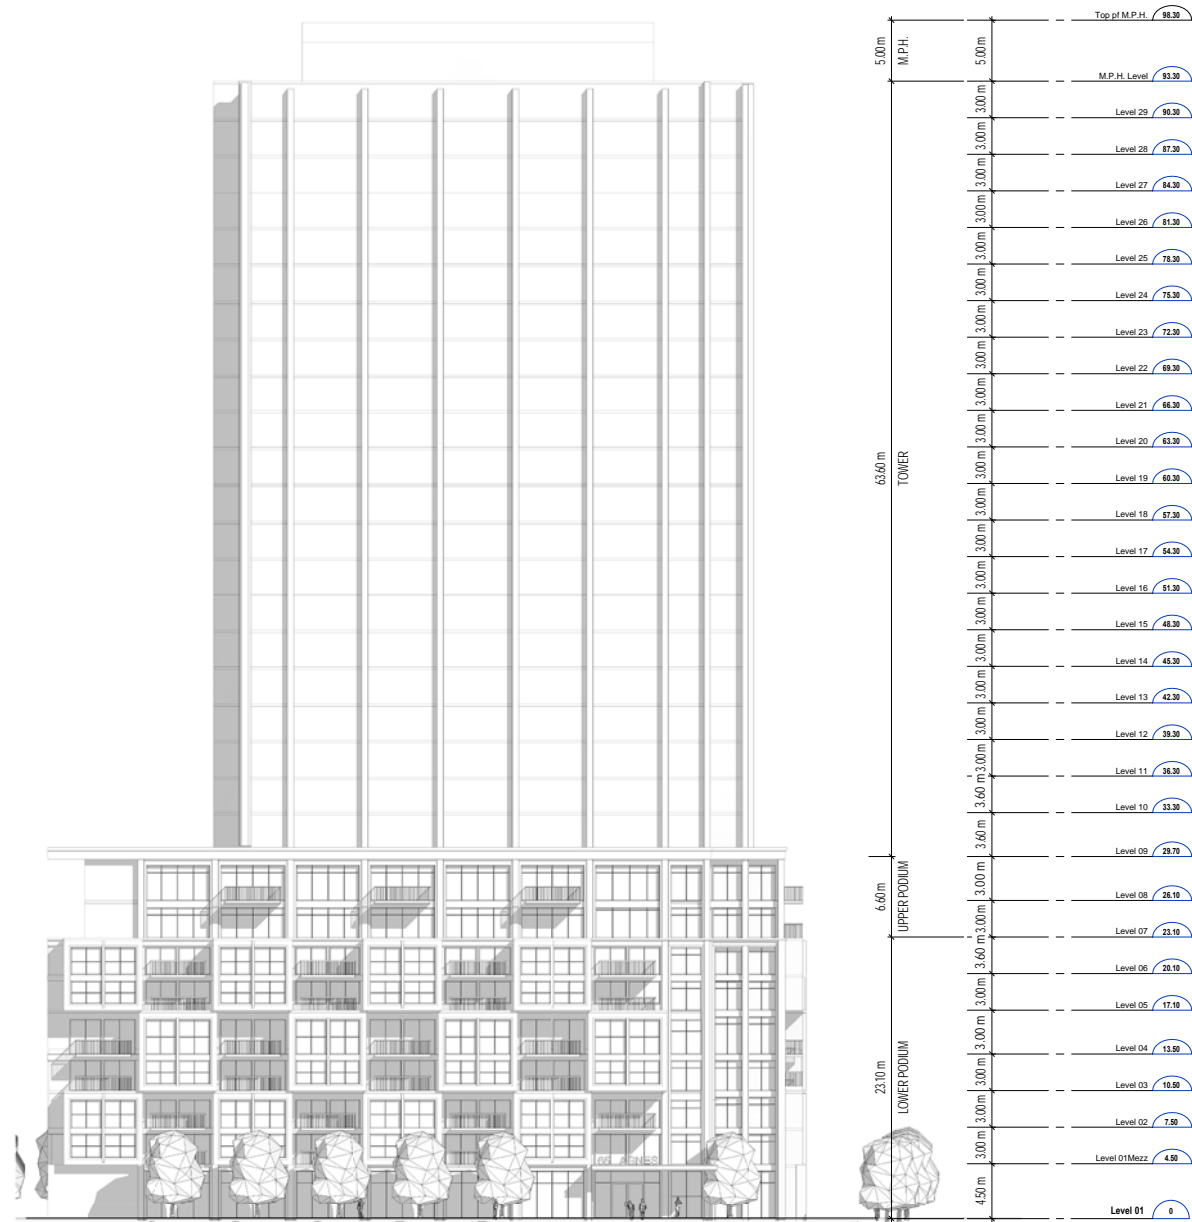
South Elevation (Prepared by Sweeny & Co Architects Inc.)
